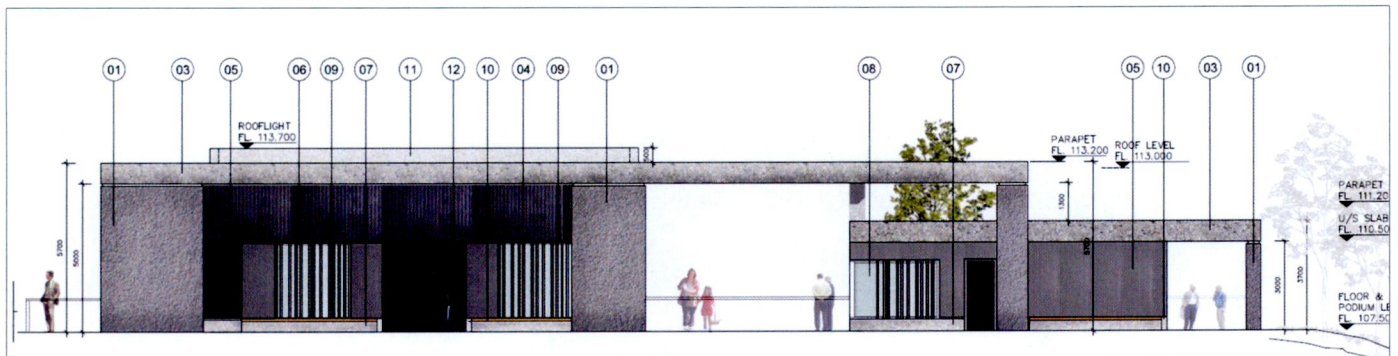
Excerpt from Reception Building South Elevation and Floor Plan, Darmody Architecture. Cropped by Tom Phillips + Associates, December 2022.
